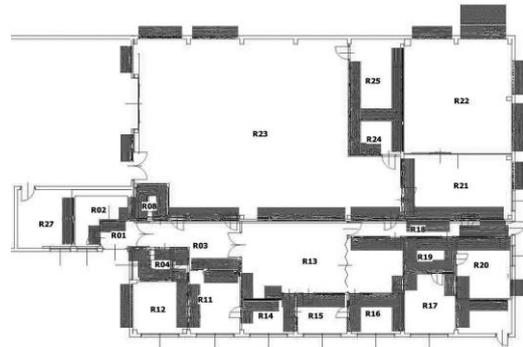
Floor plan with corresponding radar images (©ZAMG Archeo Prospections)
